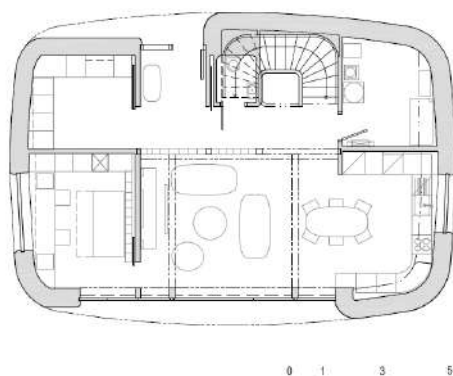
Family House in Dobříš — floor plan (Source: <https://www.archiweb.cz/b/rodinny-dum-v-dobrisi-1>)
